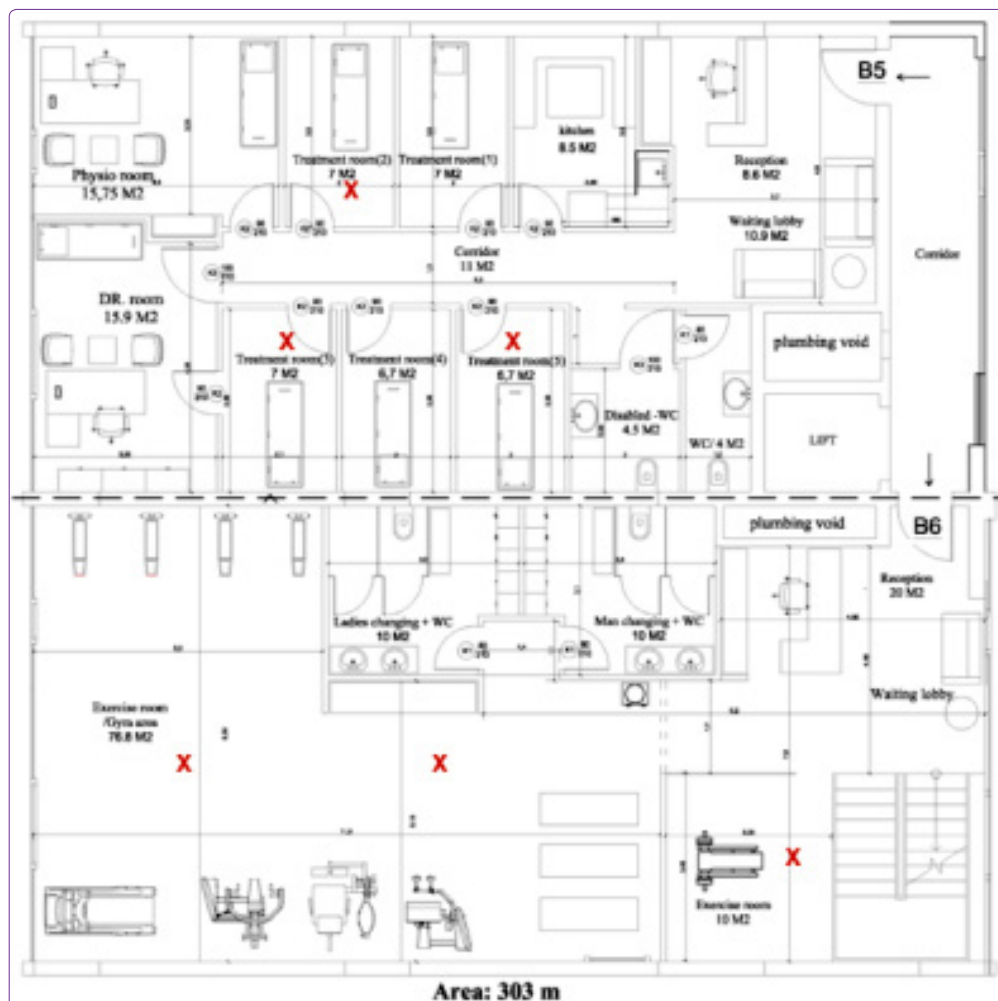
First floor plane of the case space showing treatment and exercise rooms.
